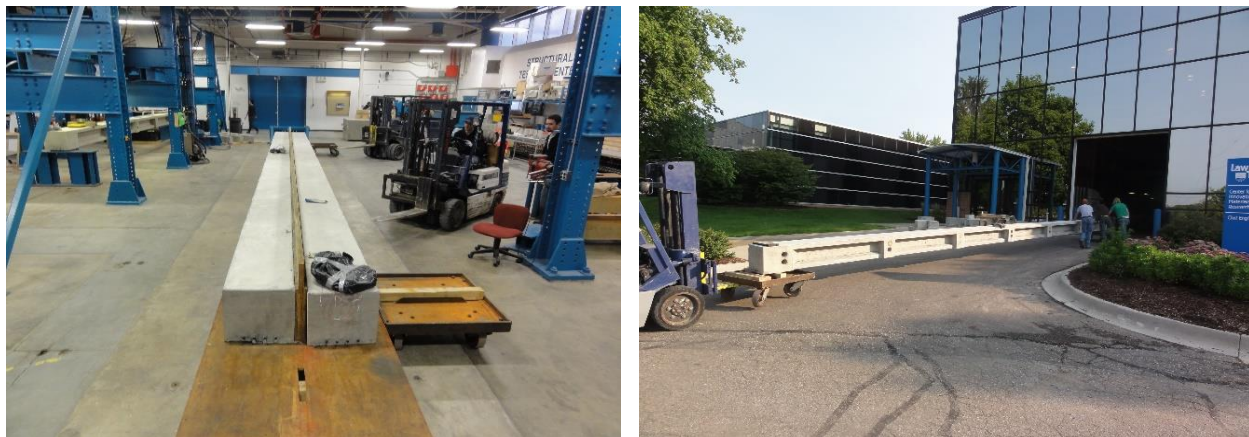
Moving the beams from the formwork to the loading facility
